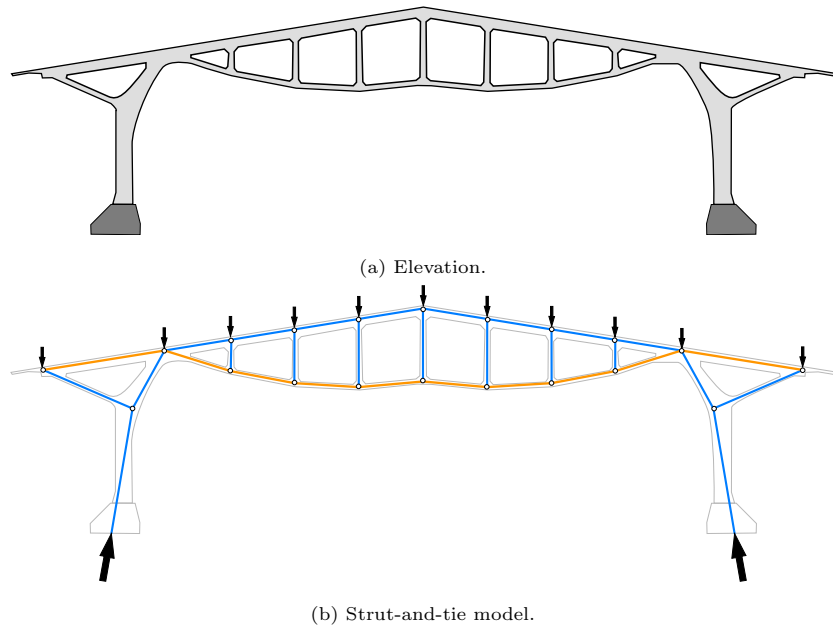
Chiasso Shed: a filigree concrete structure, after [37].
